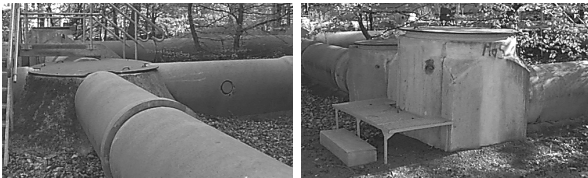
Test site at AiS, Germany: Example of Class 3/6 (Inlet) and Class 5 (pipe intersection & manhole) (left) and Class 4 (curve section & manhole) (right)
